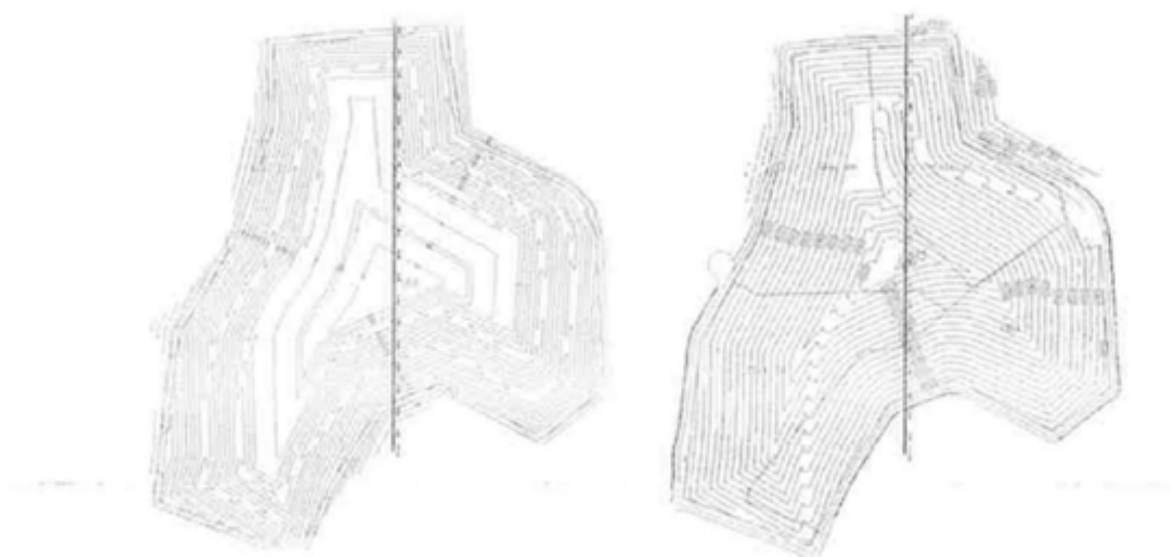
Landfill Plan View - Before and After Vertical Expansion
